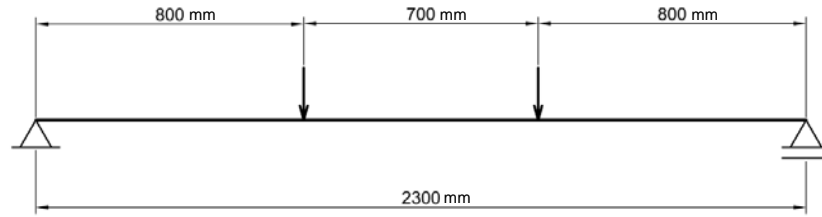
Test loading arrangement (Abdalla, 2002)
